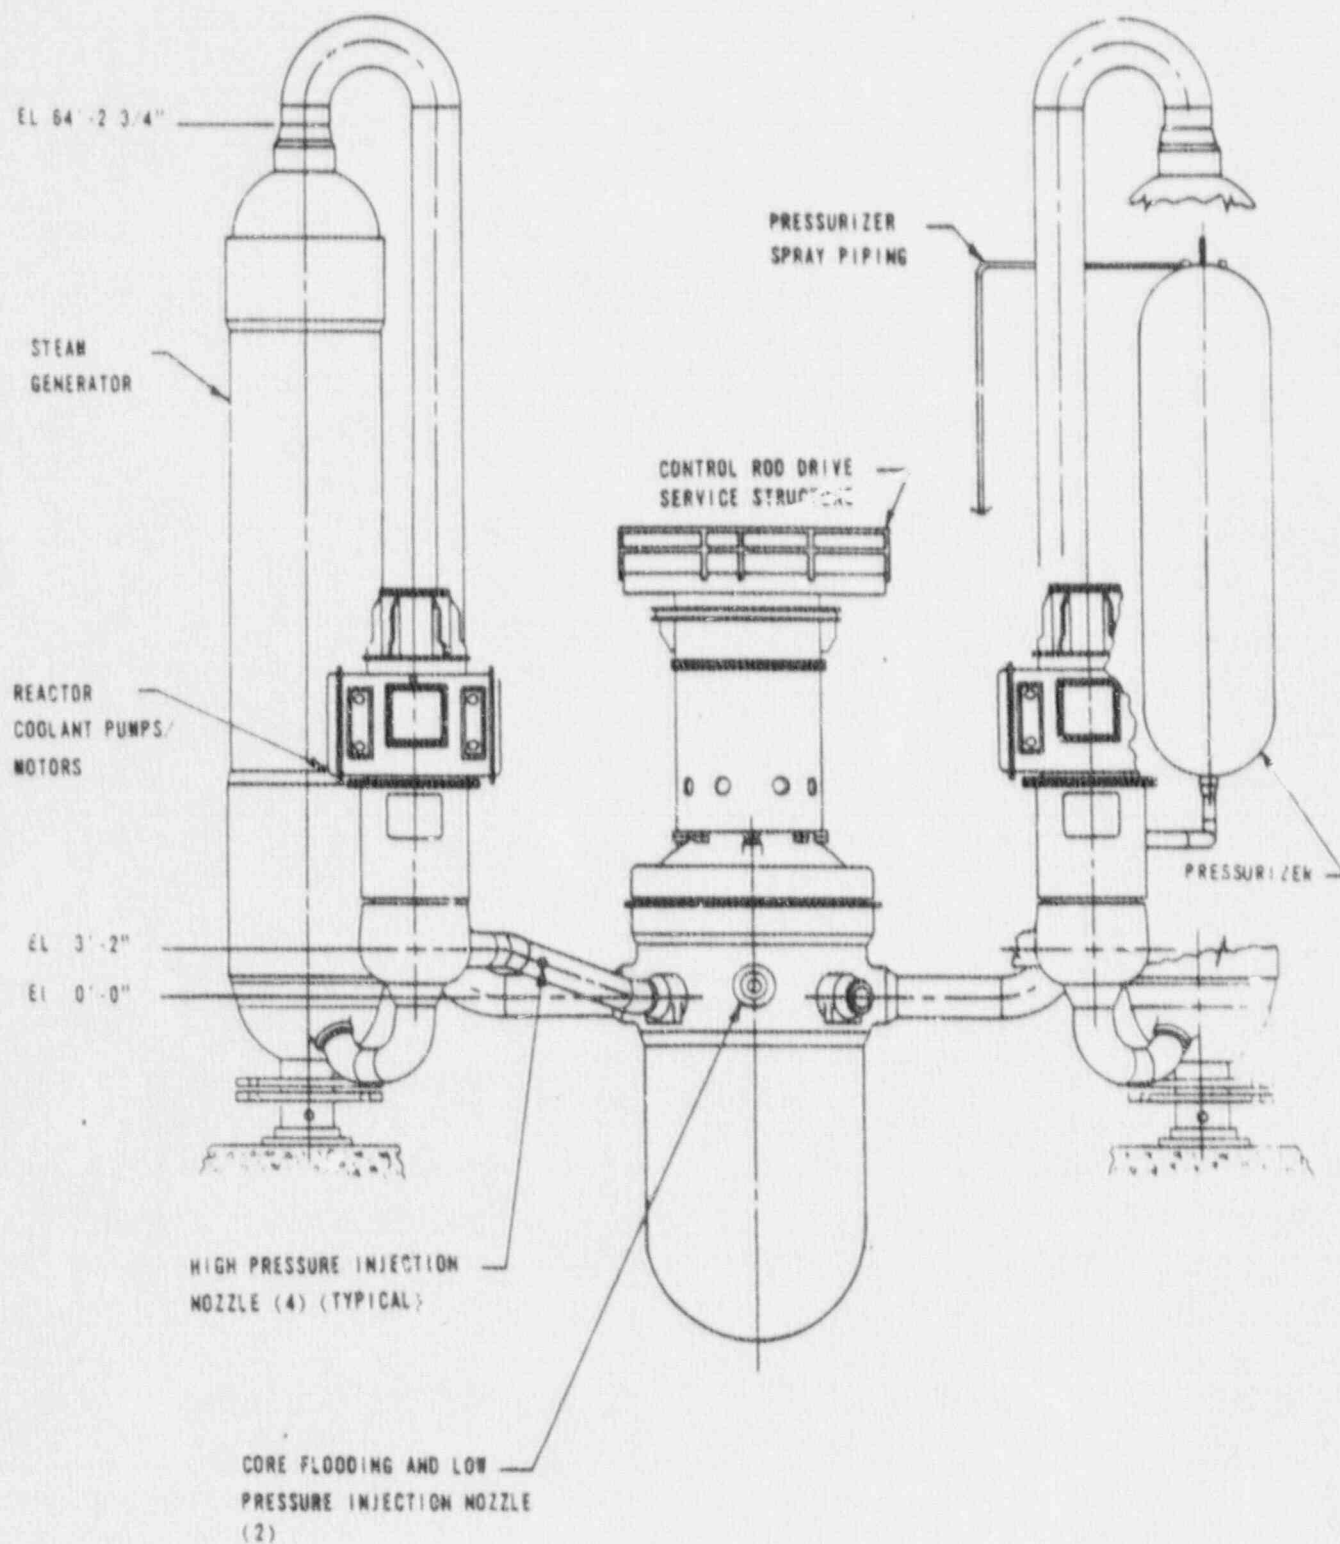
Elevation View of a B&W 205 Primary System
